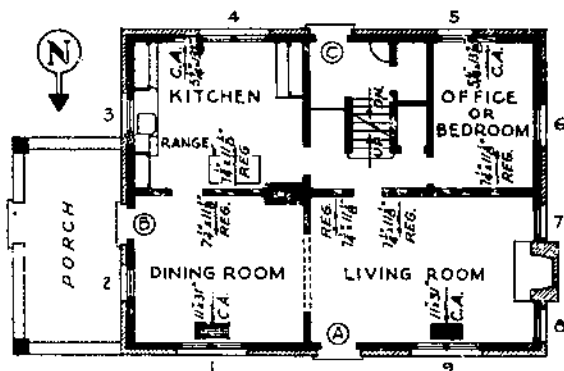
First-floor plan of house No. 6-N, showing the location of warm-air registers and cold-air returns.
